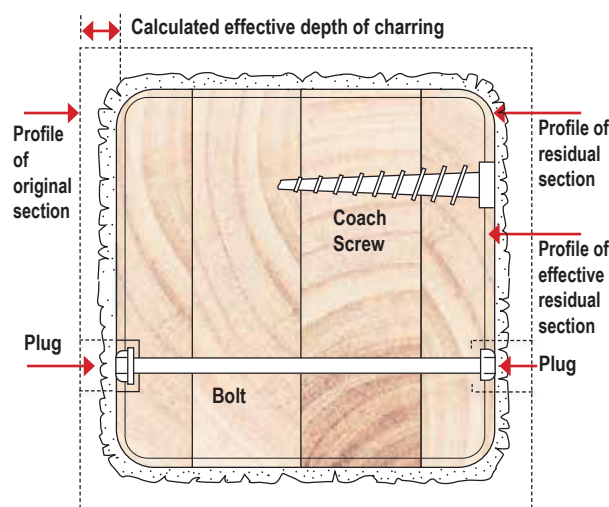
Protecting steel dowel-type fasteners with embedment, from BS5268.
